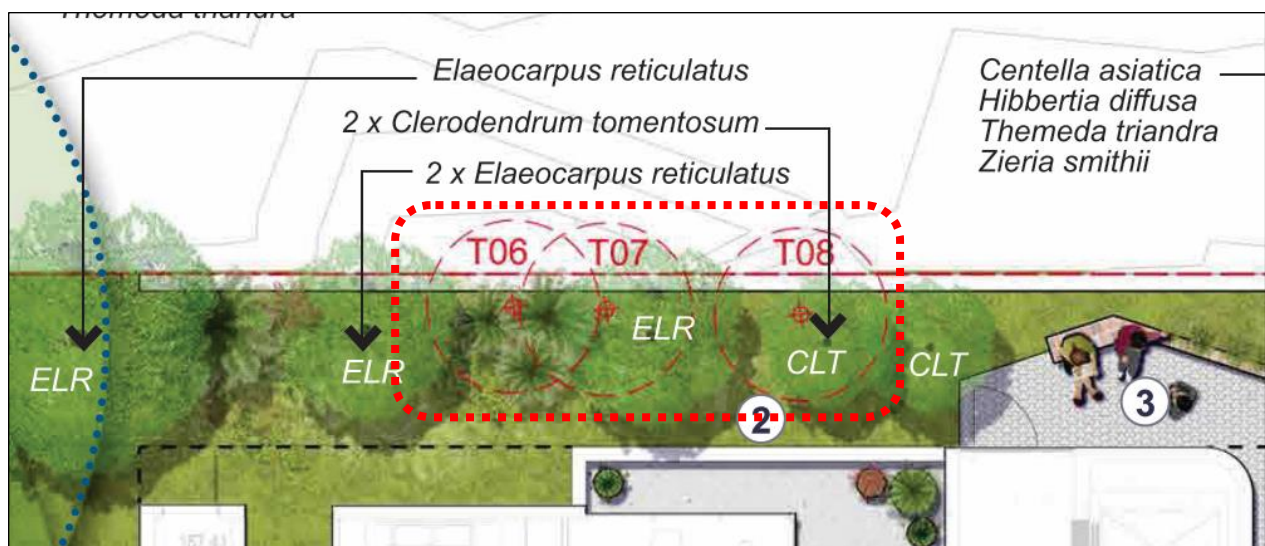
Excerpt from Landscape Plan showing location of T6-9 along northern boundary
